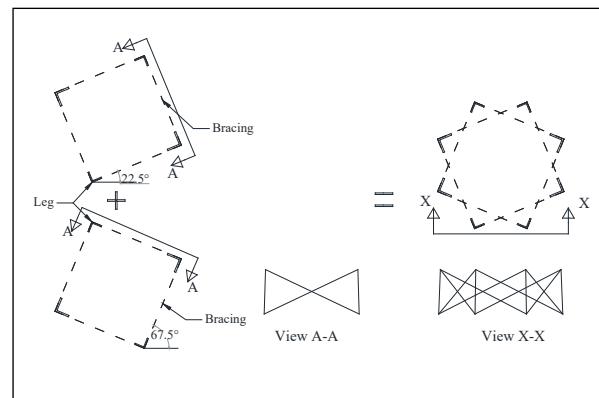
Arrangements of leg and bracings in 8-legged tower.
